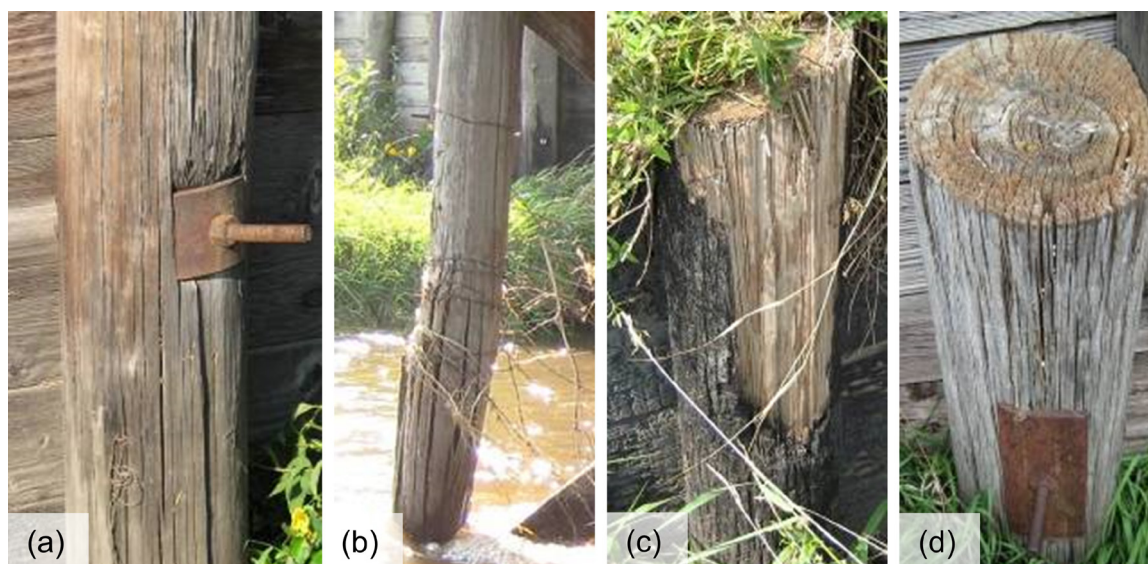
Examples of timber pile deterioration (courtesy Bridge Engineering Center at Iowa State University).
